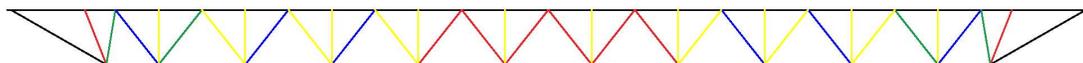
Joist colored webs for section assignment (Red = section 1, Green = section 2, Yellow = section 3, Blue = section 4).
